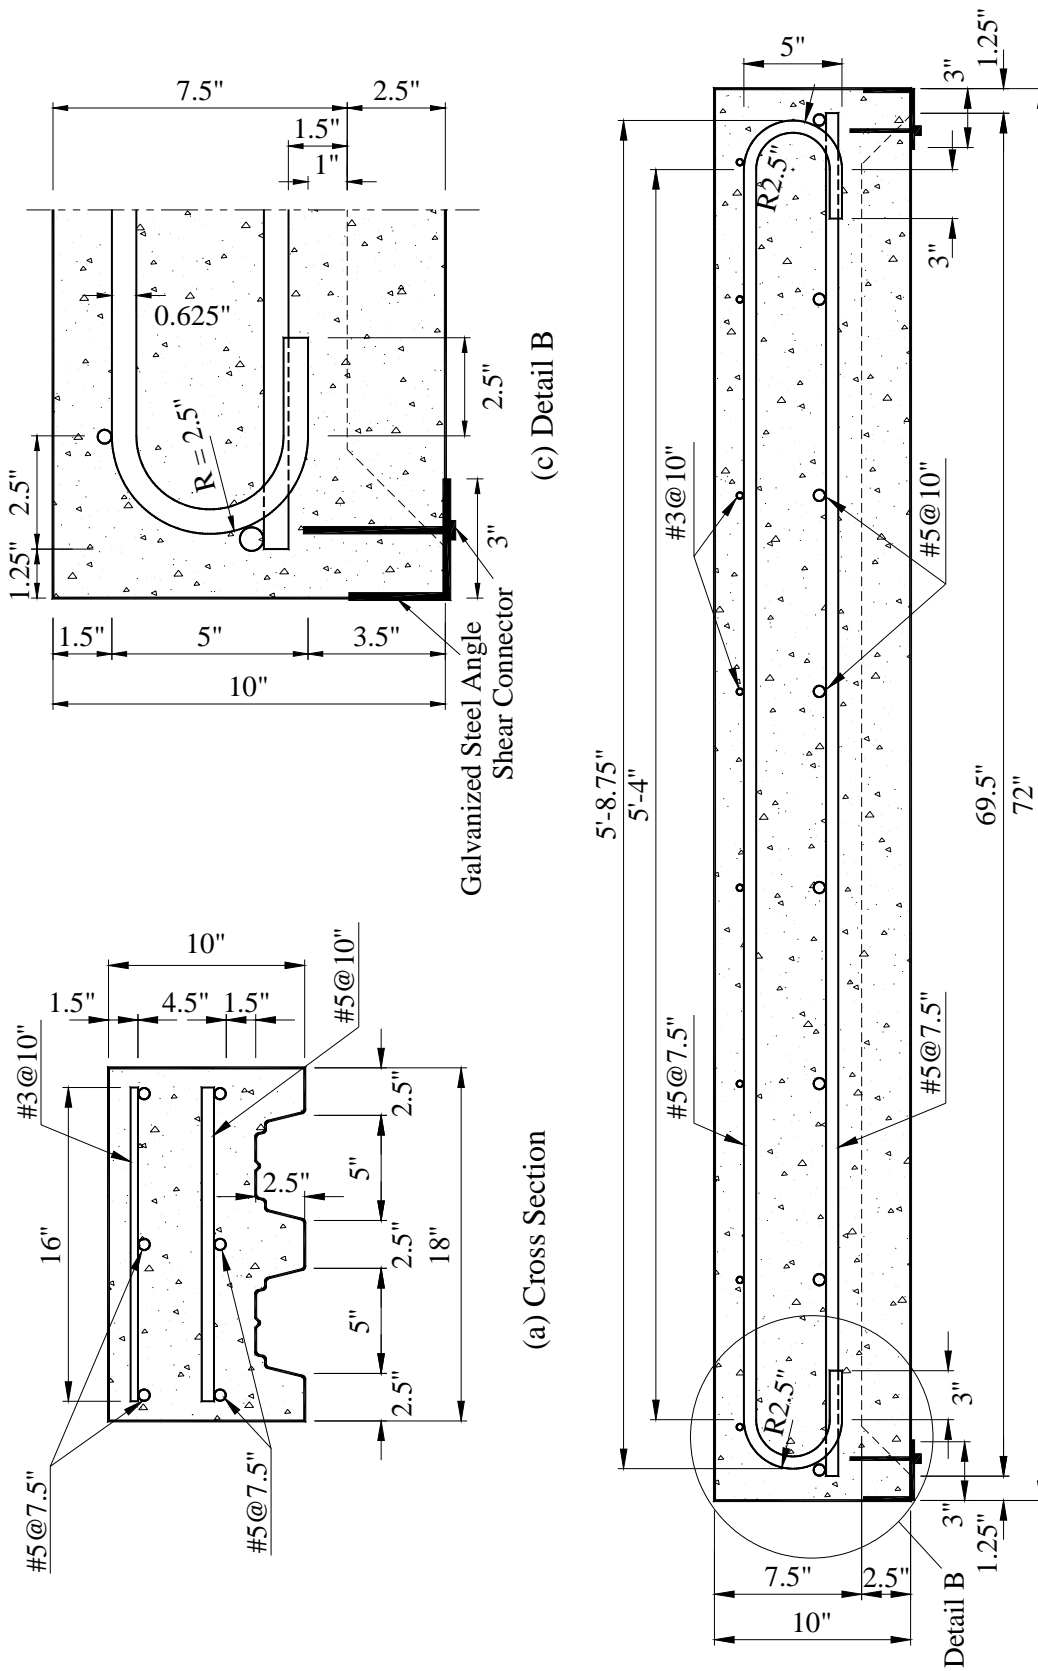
Dimensions and reinforcement details for specimens with SIPMF
